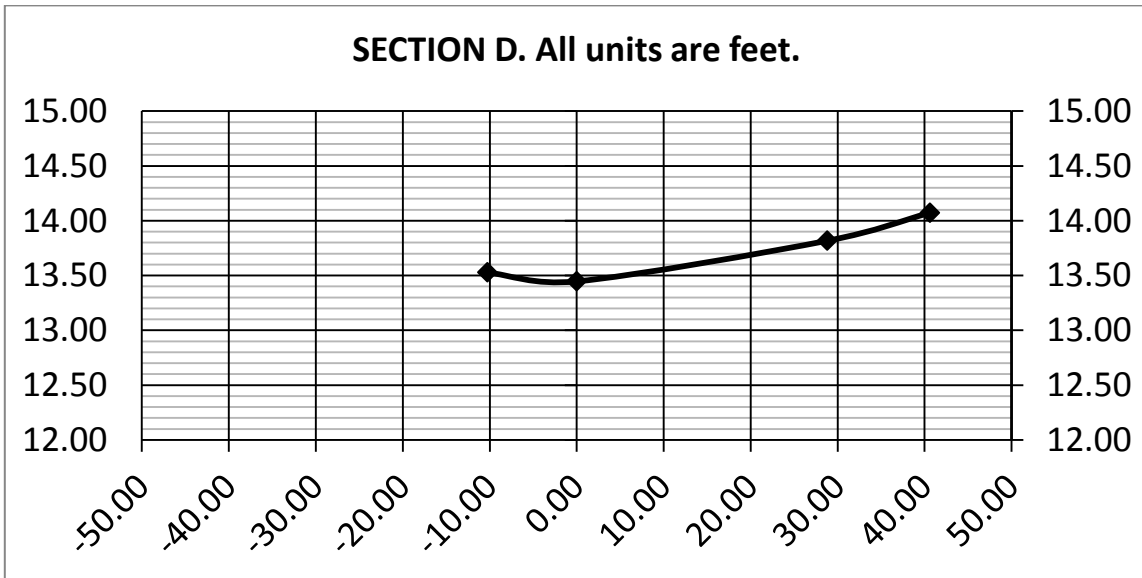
Cross section of the main swale at Point D (looking upslope), from centerline to crest.
